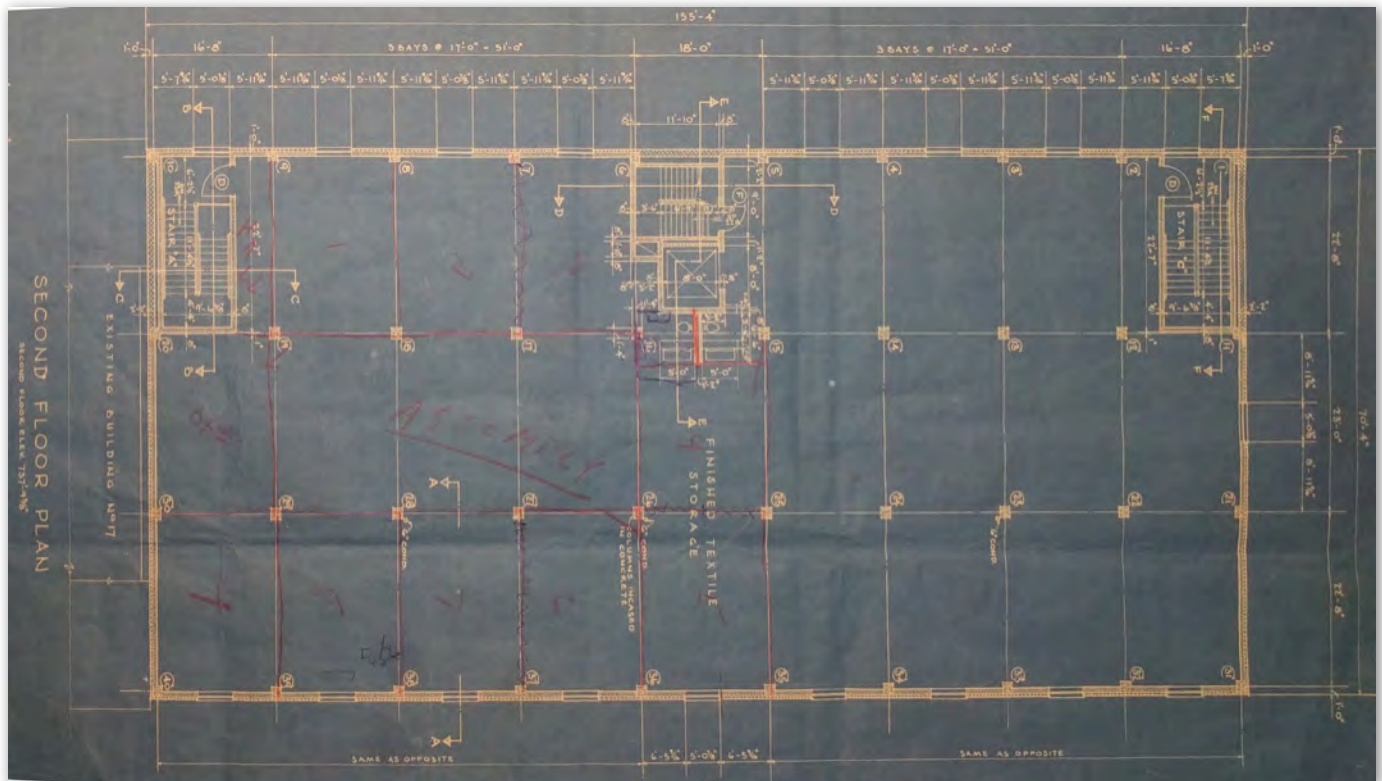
Plan of the second floor from 1953 blueprints, showing the structural grid and three staircases. At the time, in keeping with the original use of the building (a warehouse for prison-made goods), the second floor appears to have been conceived of as an open space intended for the storage of finished textiles created at the penitentiary (SCI-Pittsburgh Facilities Archive).
